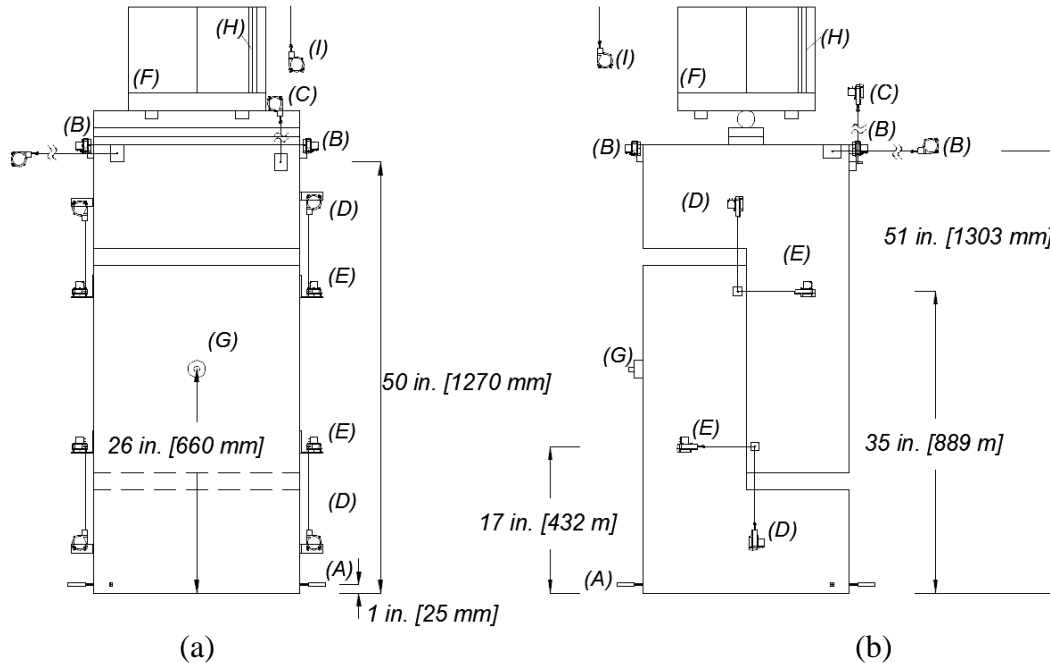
External instrumentation elevation view for specimens containing #5 [#16M] reinforcing bars across the interface: (a) Front view elevation, (b) side view elevation
